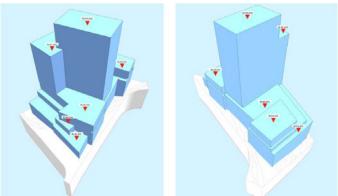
3D Views of proposed building envelope (Source: ficstudio, 2023)
